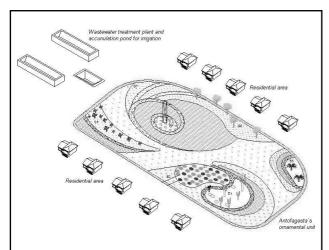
General arrangement of Antofagasta's ornamental unit composed by stabilization ponds to treat water from residential area, and a demonstrative park
